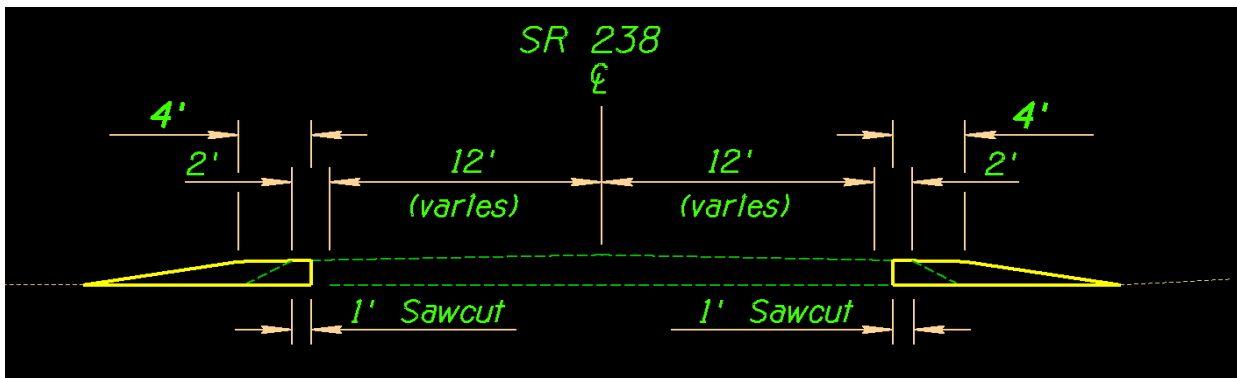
Proposed Typical Cross Section for non-reconstruction Locations
